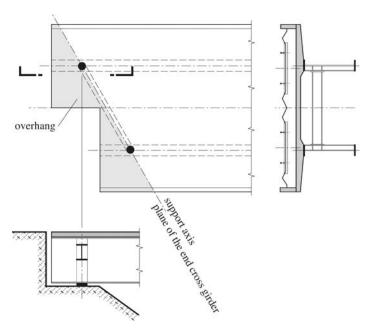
Recommended layout for the abutments and supports of a skew bridge.
